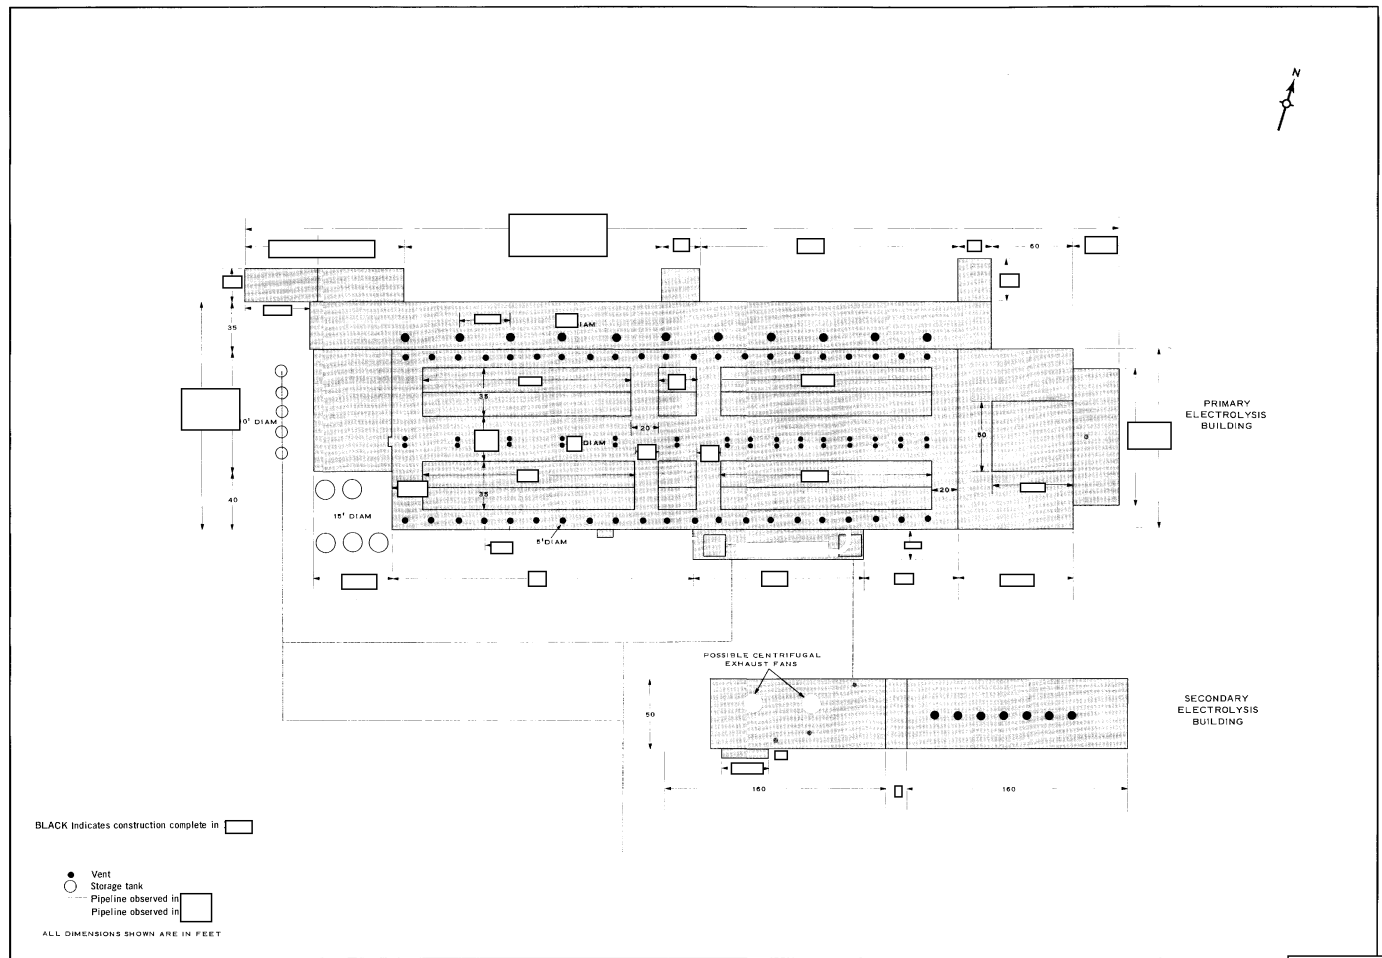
LAYOUT OF HEAVY WATER PLANT.
